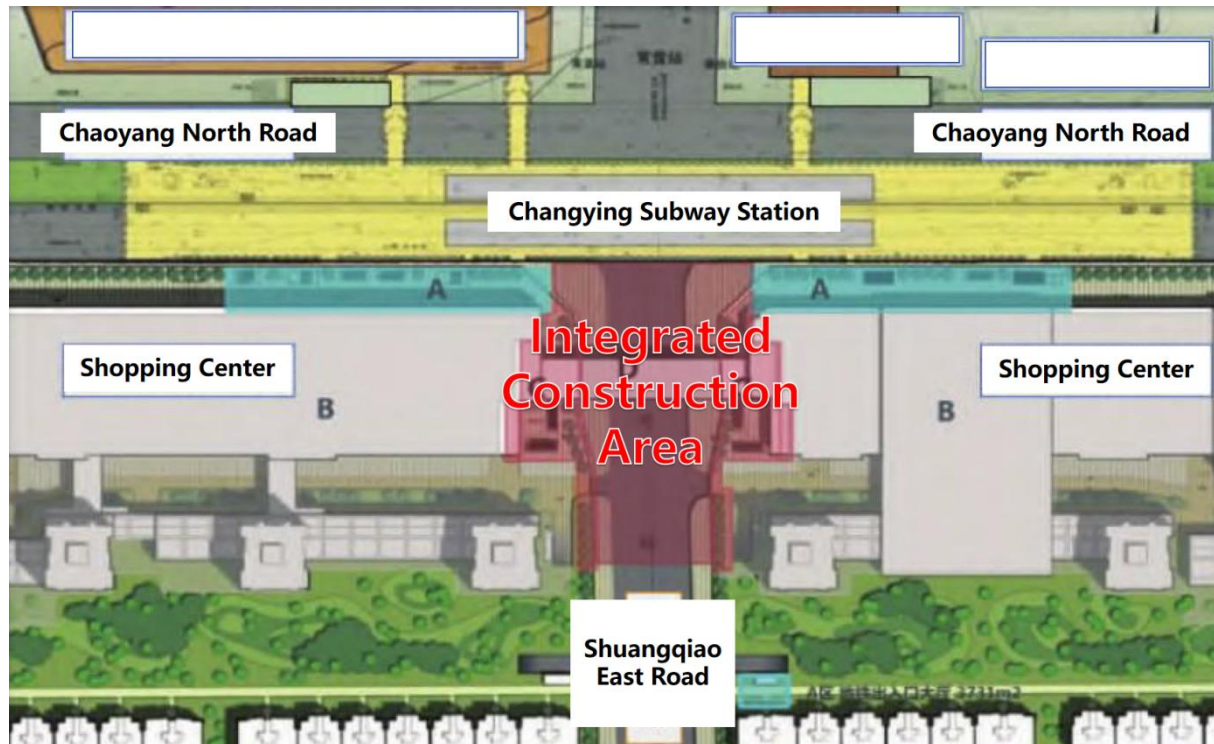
Schematic Diagram of Underground Connectivity Construction Mode at Changying Subway Station
